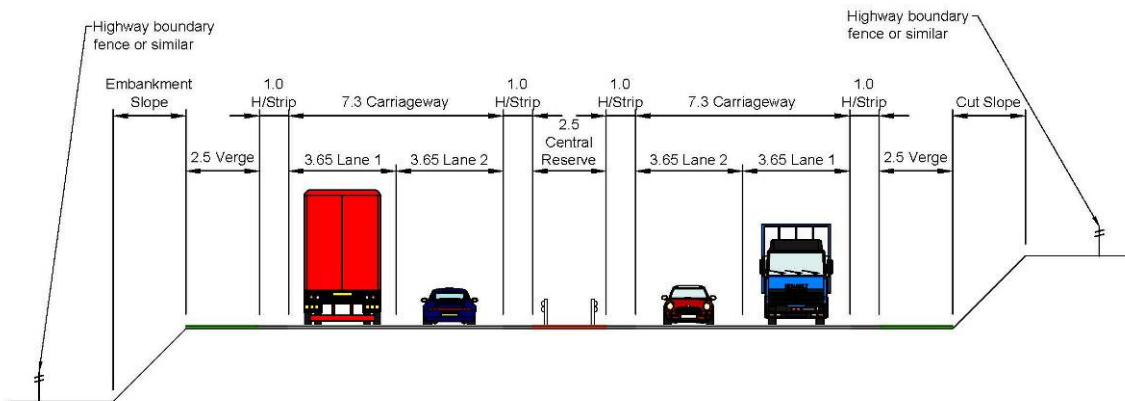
Minimum Cross Section Dimensions for a Dual Carriageway
